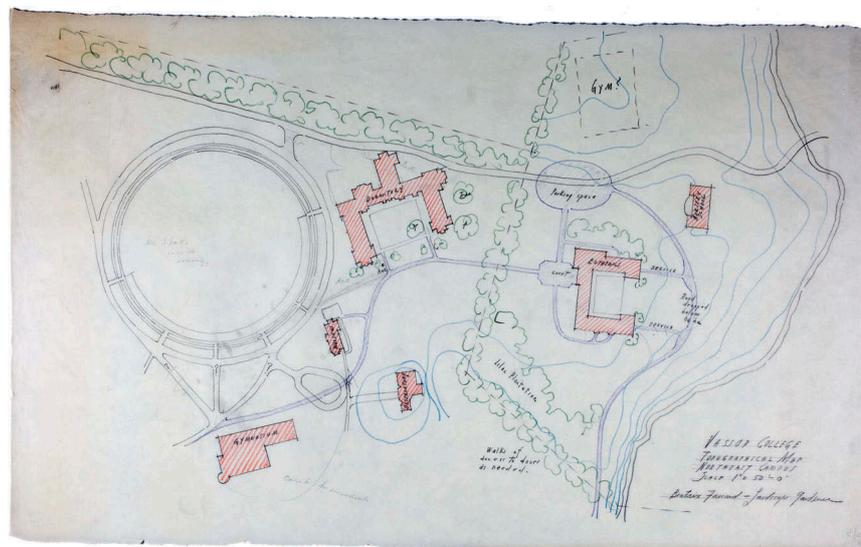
Beatrix Farrand, Vassar College, topographical map showing proposed roads, walkways, plantings, and gym site, Northeast campus, 1928 (EDA-UCB).
